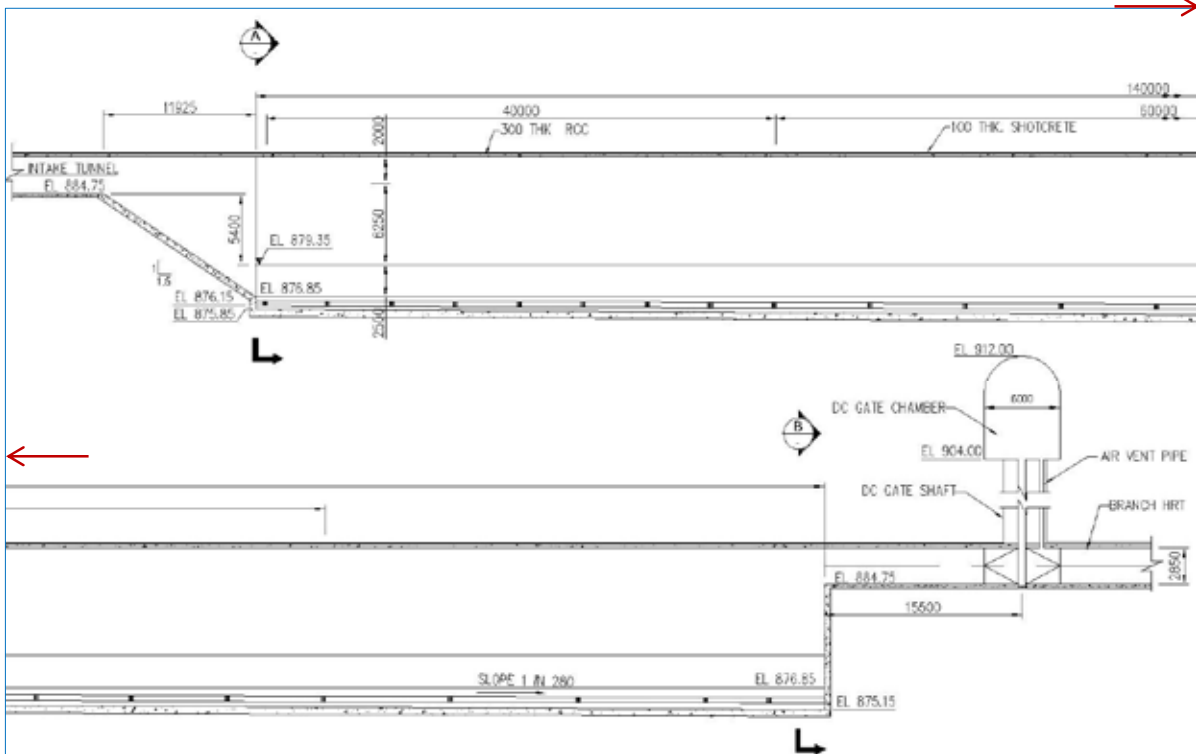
Longitudinal Section through Desilting Chamber with Settling Trench & Flushing Duct
